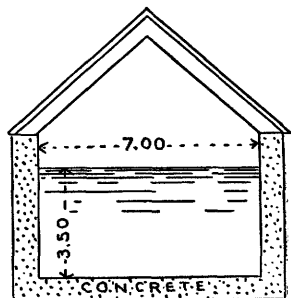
Section of tunnel No. 1, in earth, of Gage canal system.
